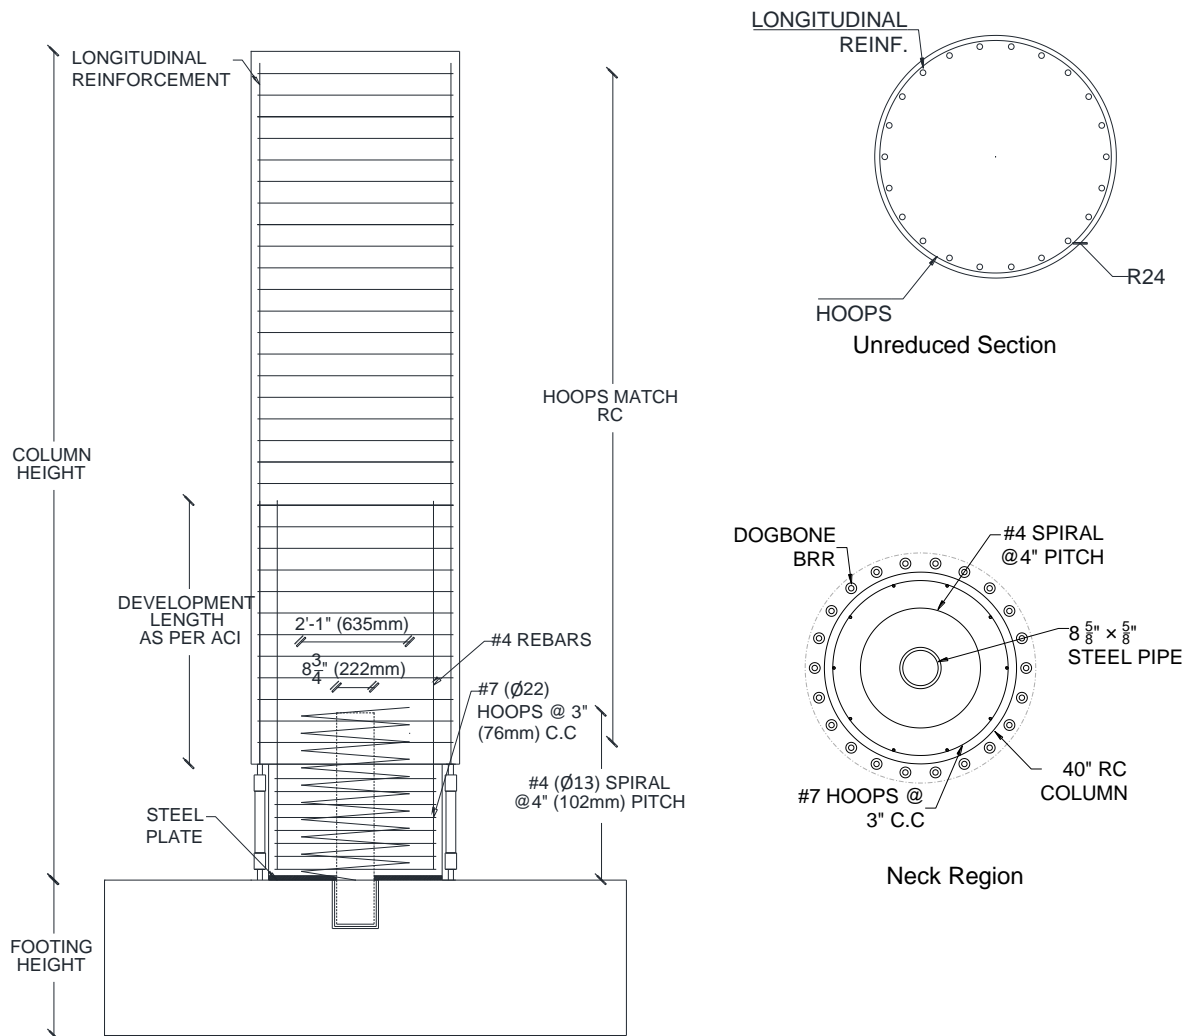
Proposed Repairable Column Detailing with 4-ft Diameter
